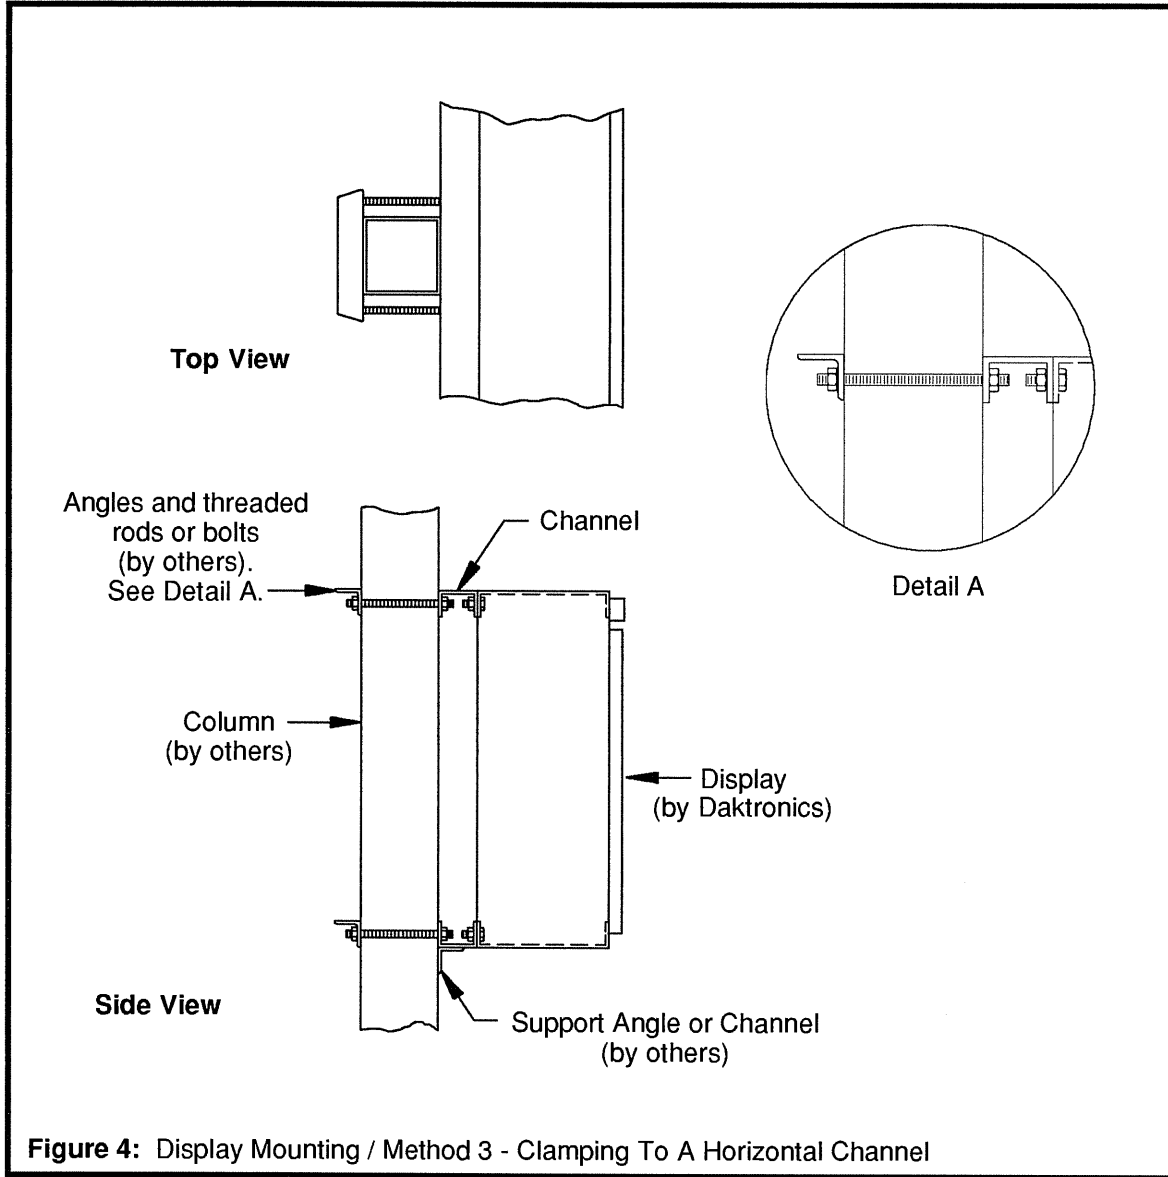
Display Mounting / Method 3 - Clamping To A Horizontal Channel
